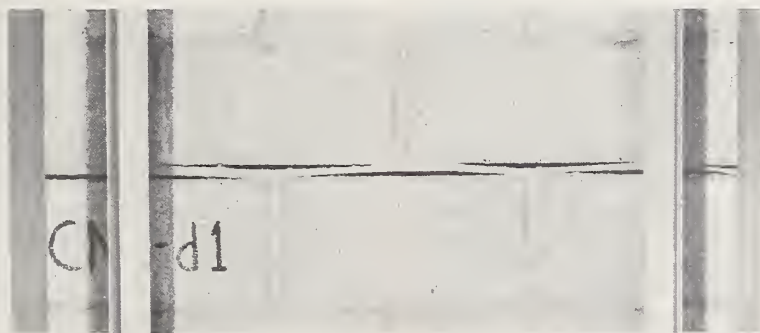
Typical failure of concrete masonry wall subjected to flexural load with bed joints normal to span.
